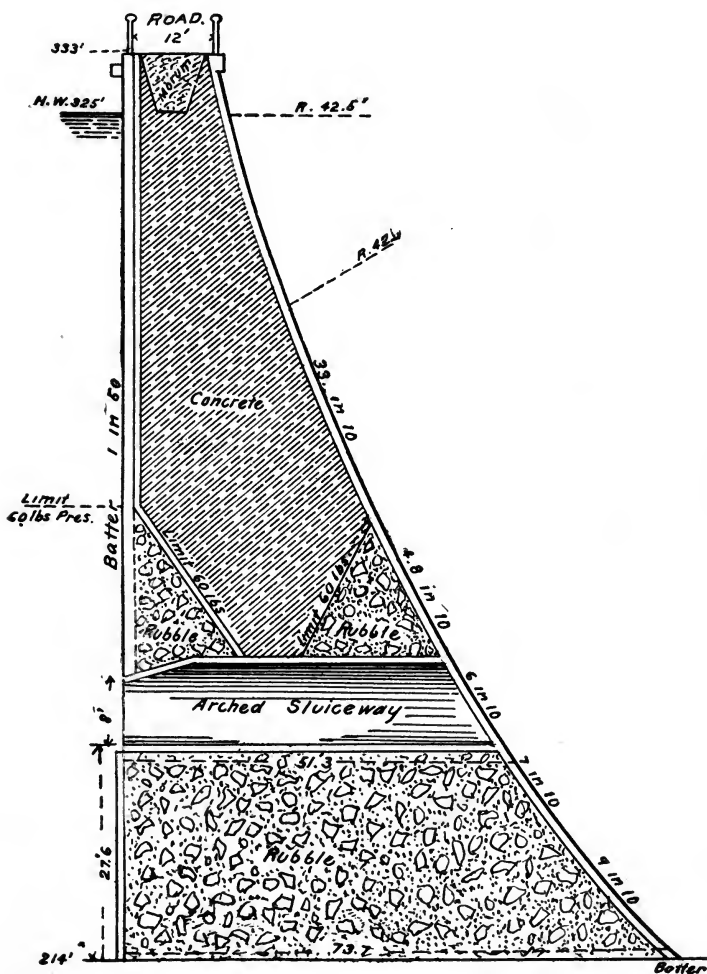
CROSS-SECTION OF BHATGUR DAM, INDIA.
